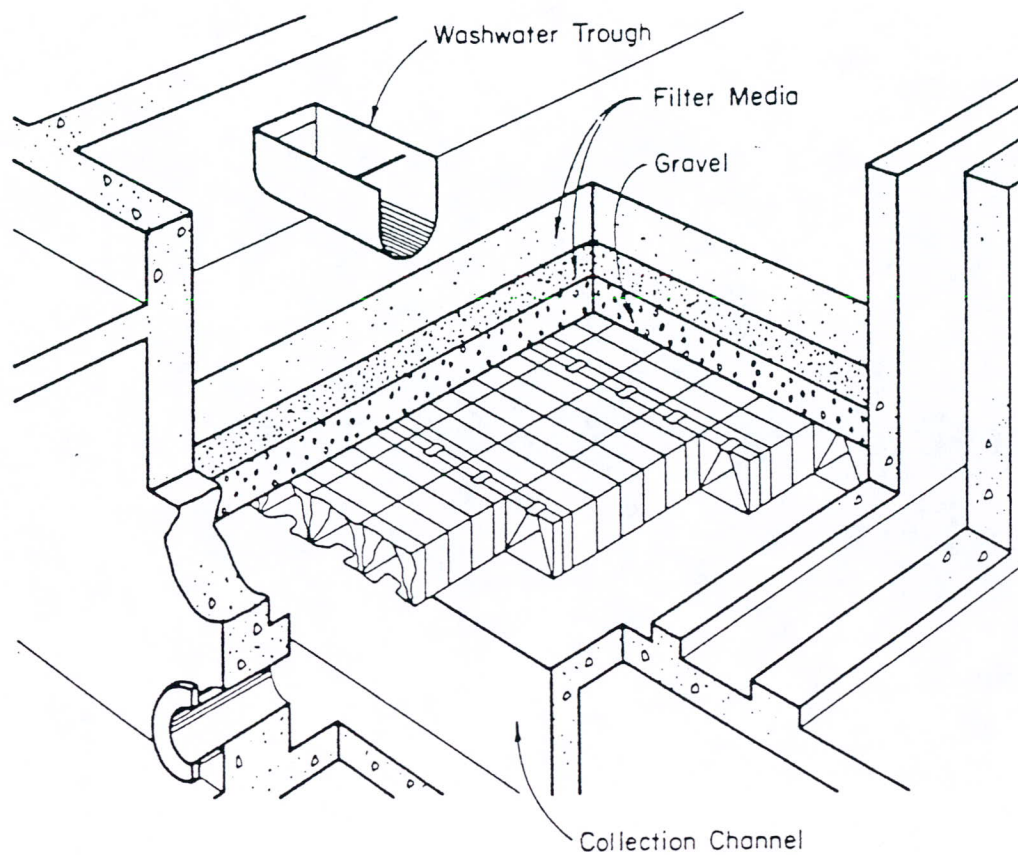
shows the arrangement of the Roberts underdrain system assuming an anthracite mono-medium is used and assuming the washwater troughs are replaced with new fiberglass troughs installed at a higher elevation. The specific recommendations for media and washwater trough modifications will be made during the design phase following pilot plant testing.
